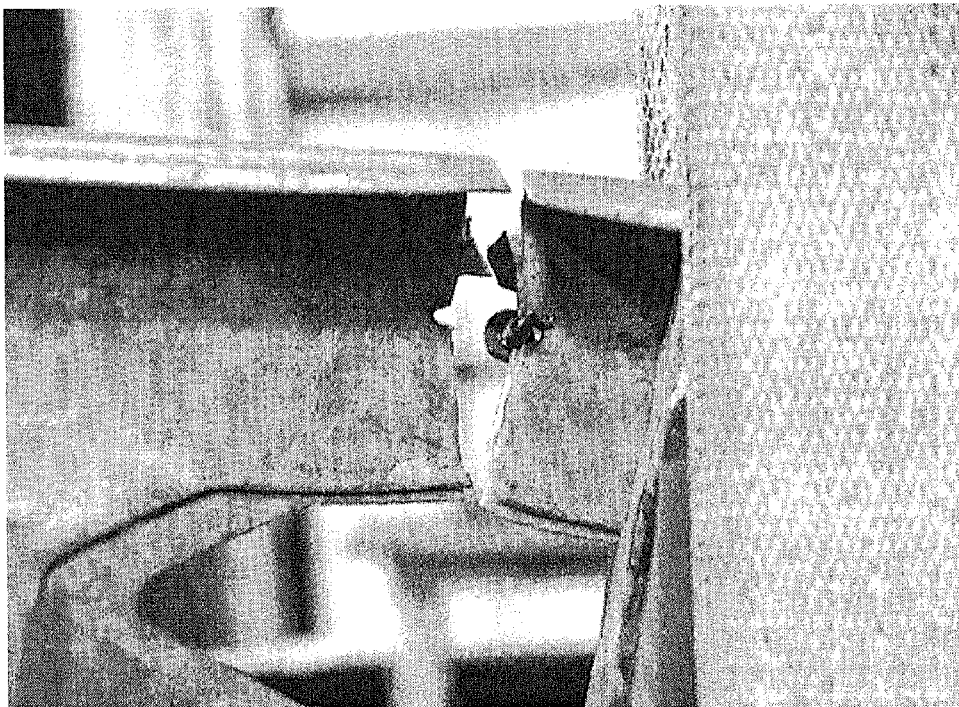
Beam 24 Failure Crack at Utility Hole
